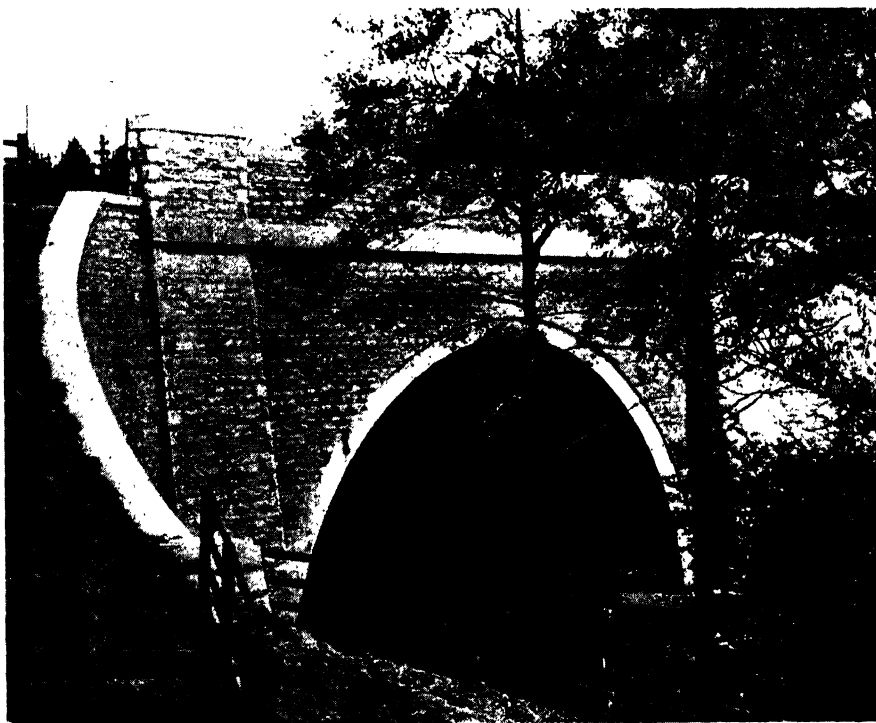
CLEOBURY MORTIMER BRIDGE WIDENING.
